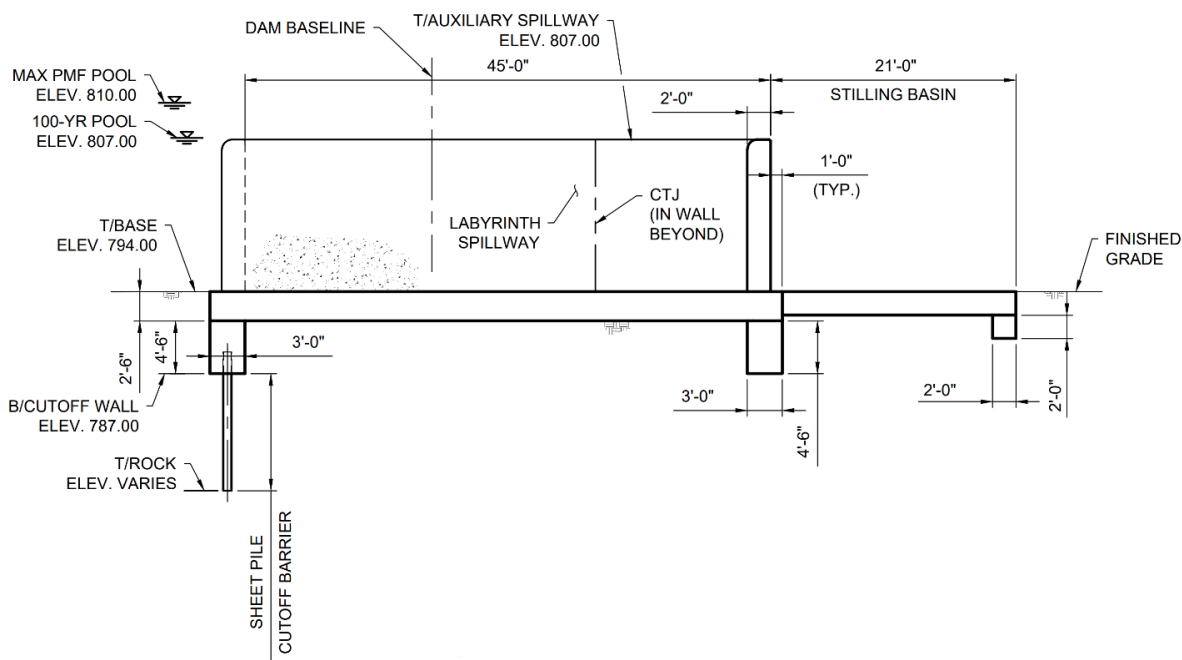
Typical Labyrinth Spillway and Stilling Basin Section
